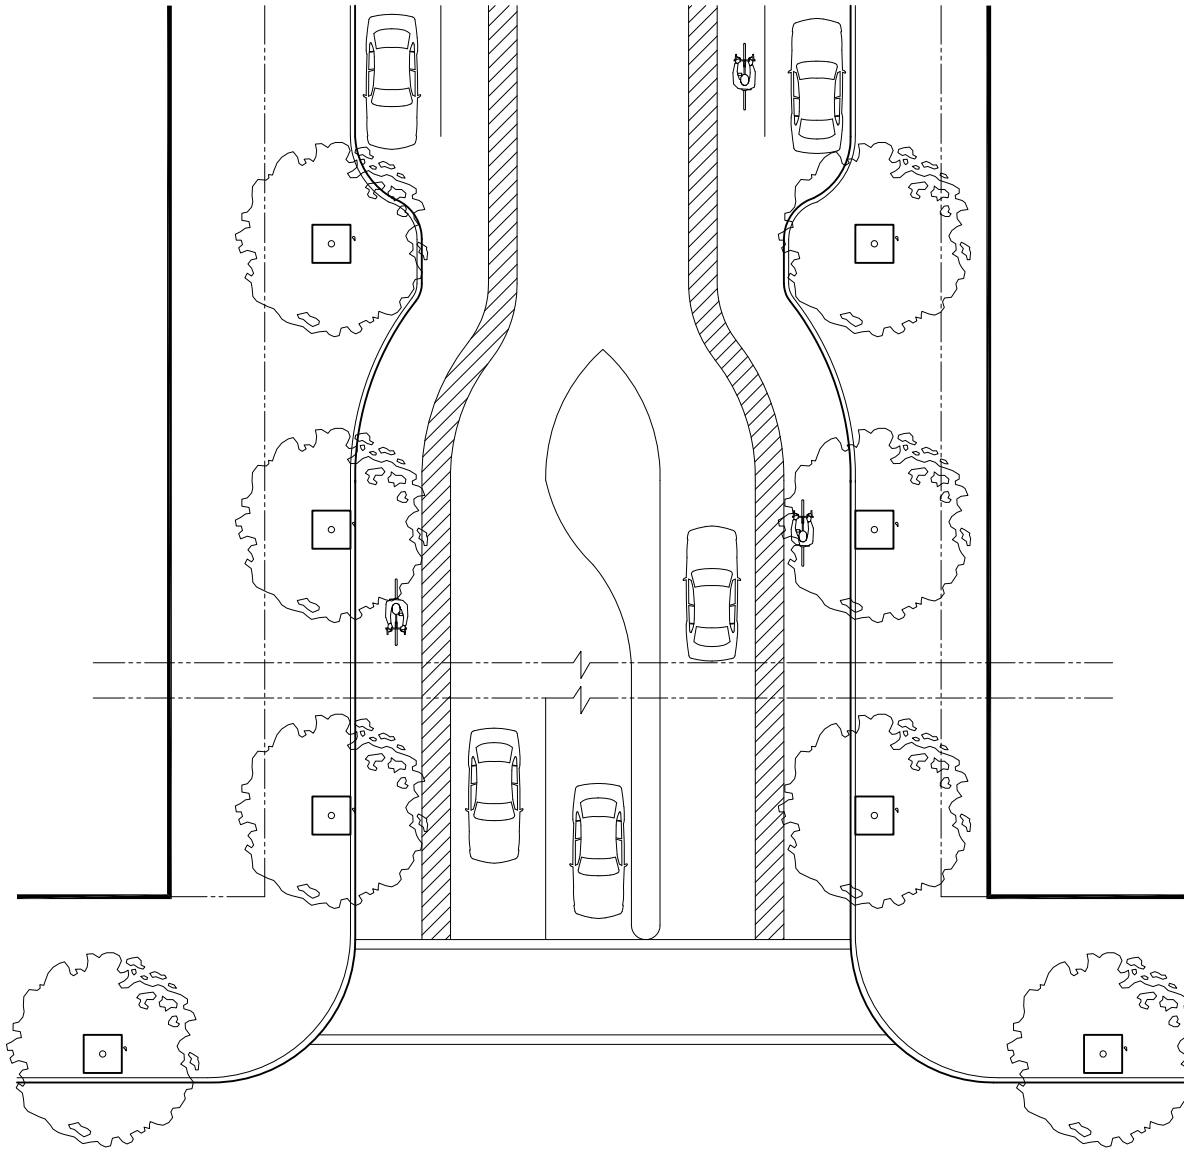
Street Type 3: Neighborhood Street – Typical Intersection (Plan View)
